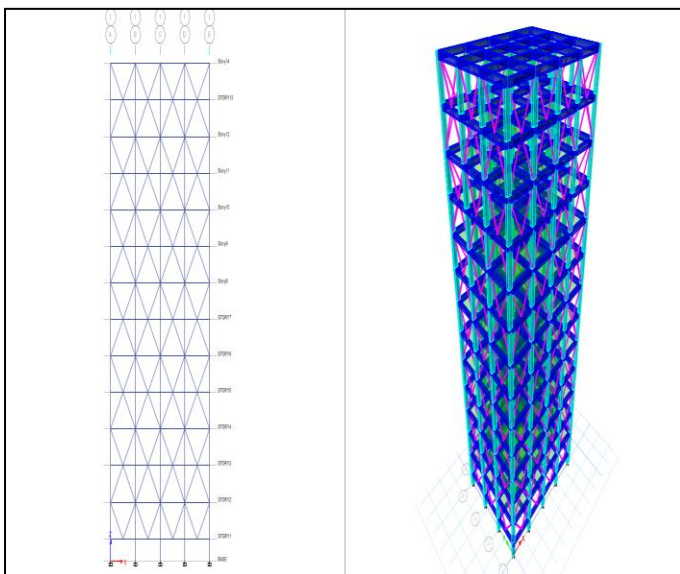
Elevation and 3D view of RC frame structure with combine V type bracing
